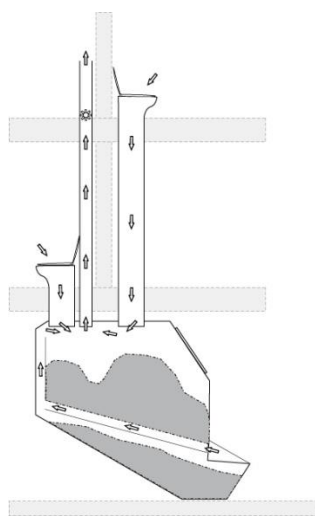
Cross section of a single-vault composting toilet, showing the ventilation system (source: Berger and Lorenz-Ladener, 2008).
